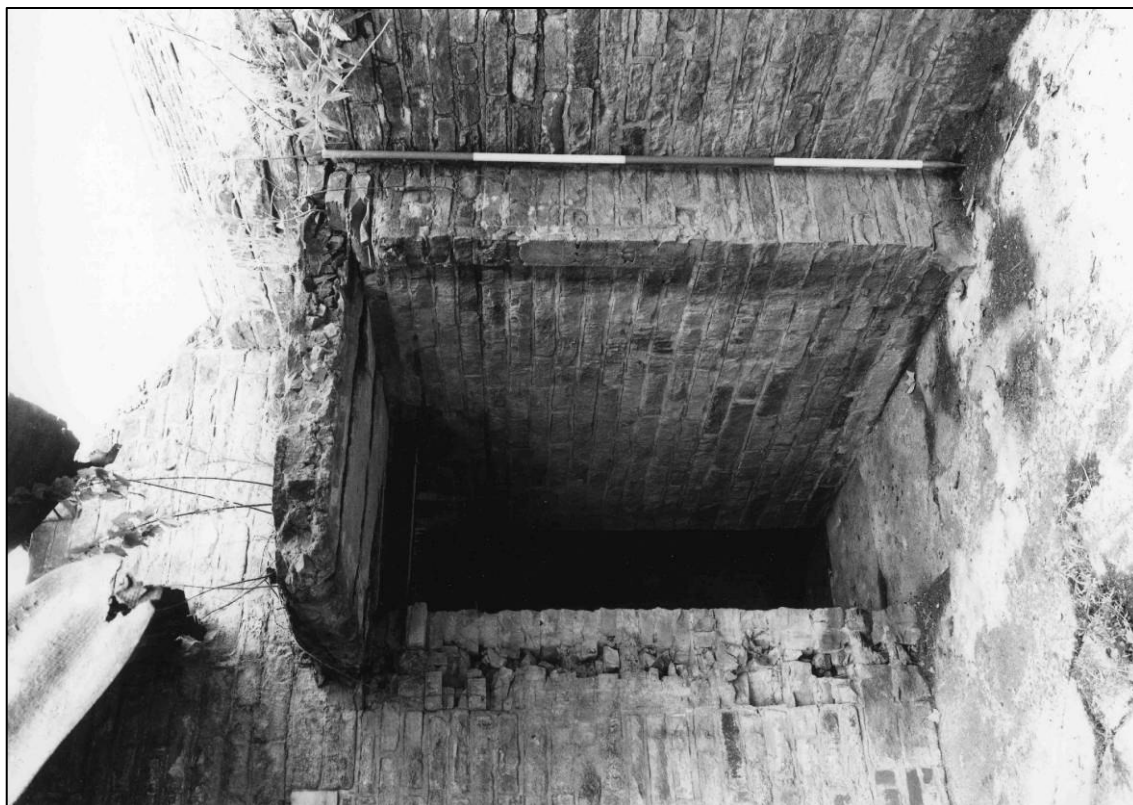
Building N4, former fan passage entrance, looking NW (photo 4/1) (top to left).
